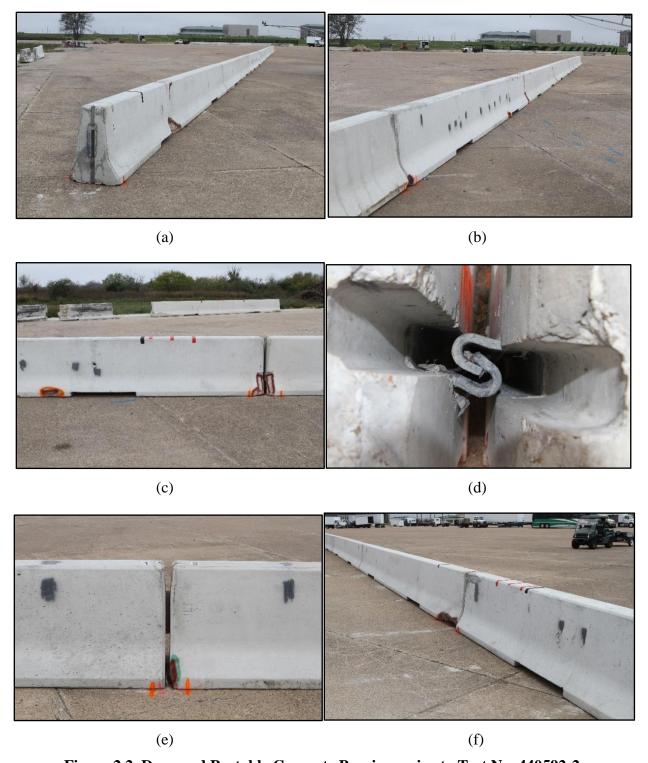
Damaged Portable Concrete Barriers prior to Test No. 440592-2.
